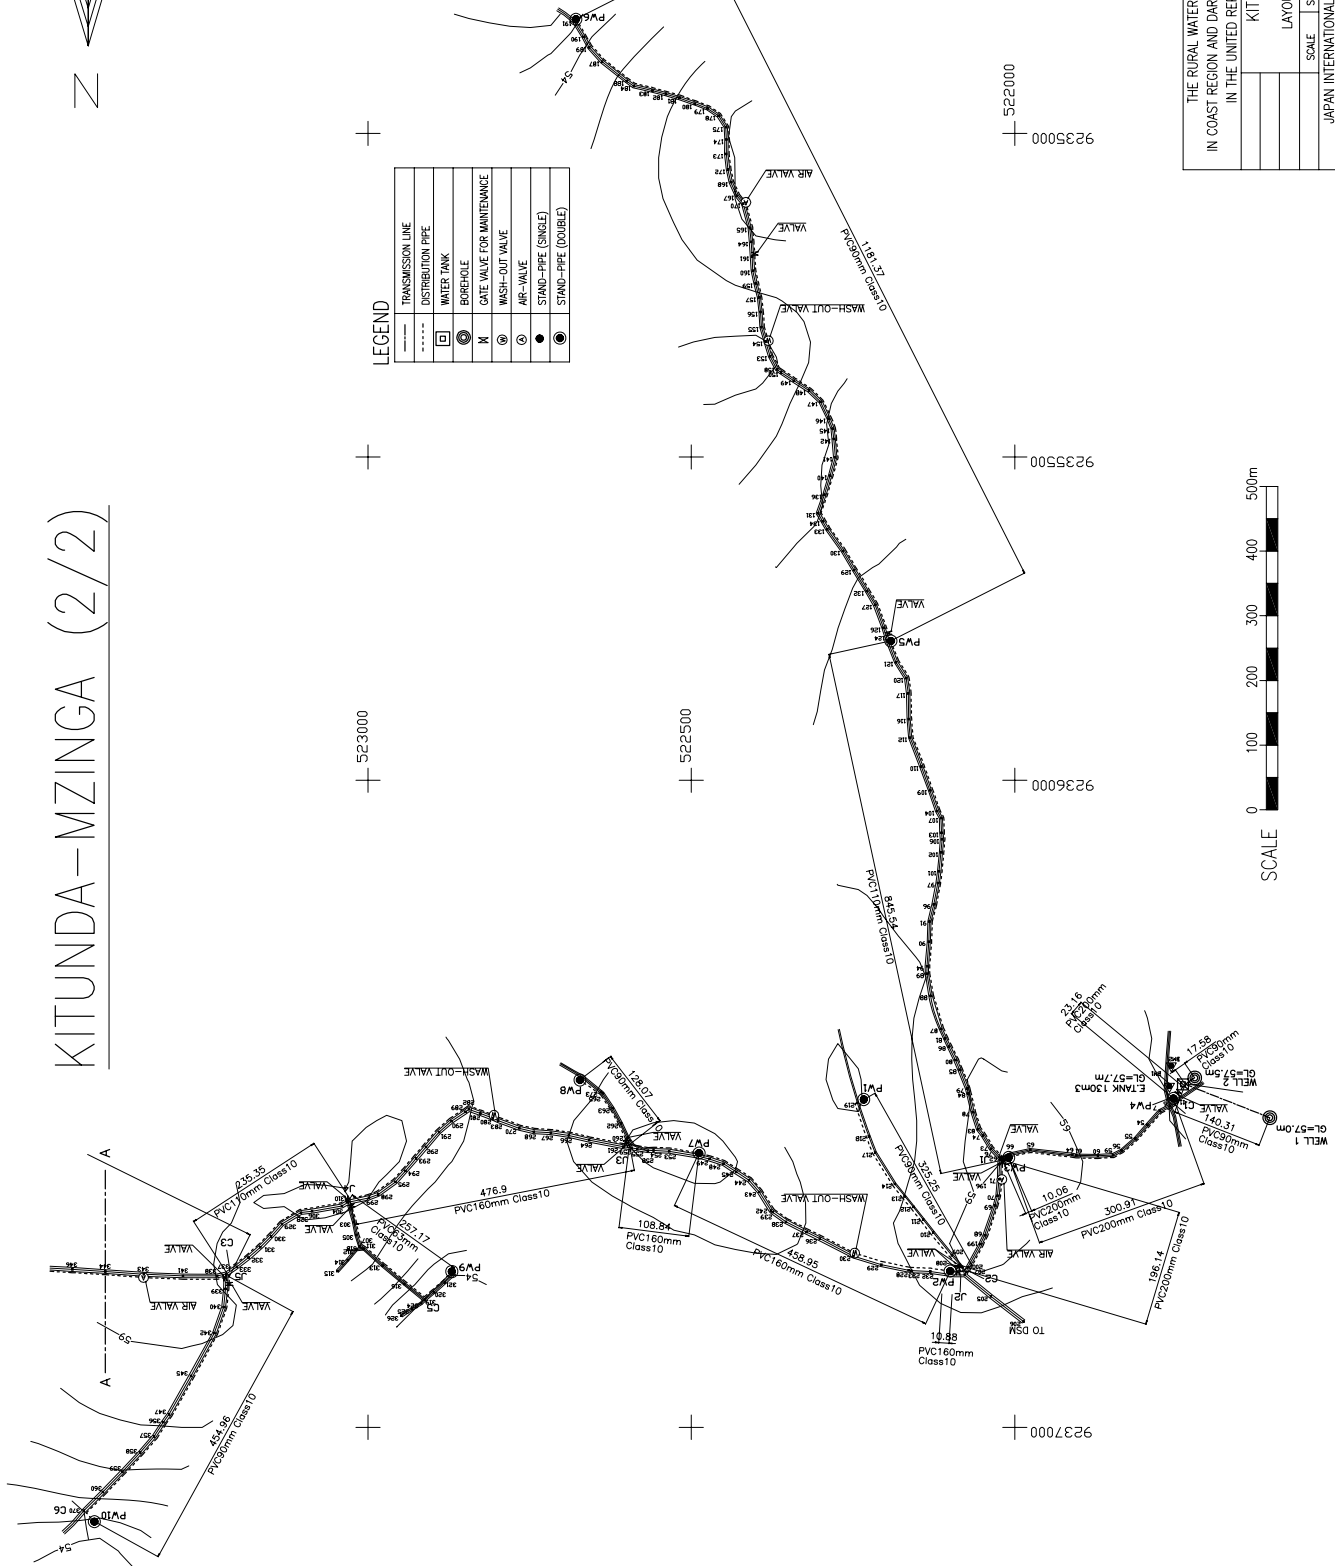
Layout Plan of Water Supply Facility (Kitunda-Mzinga)
